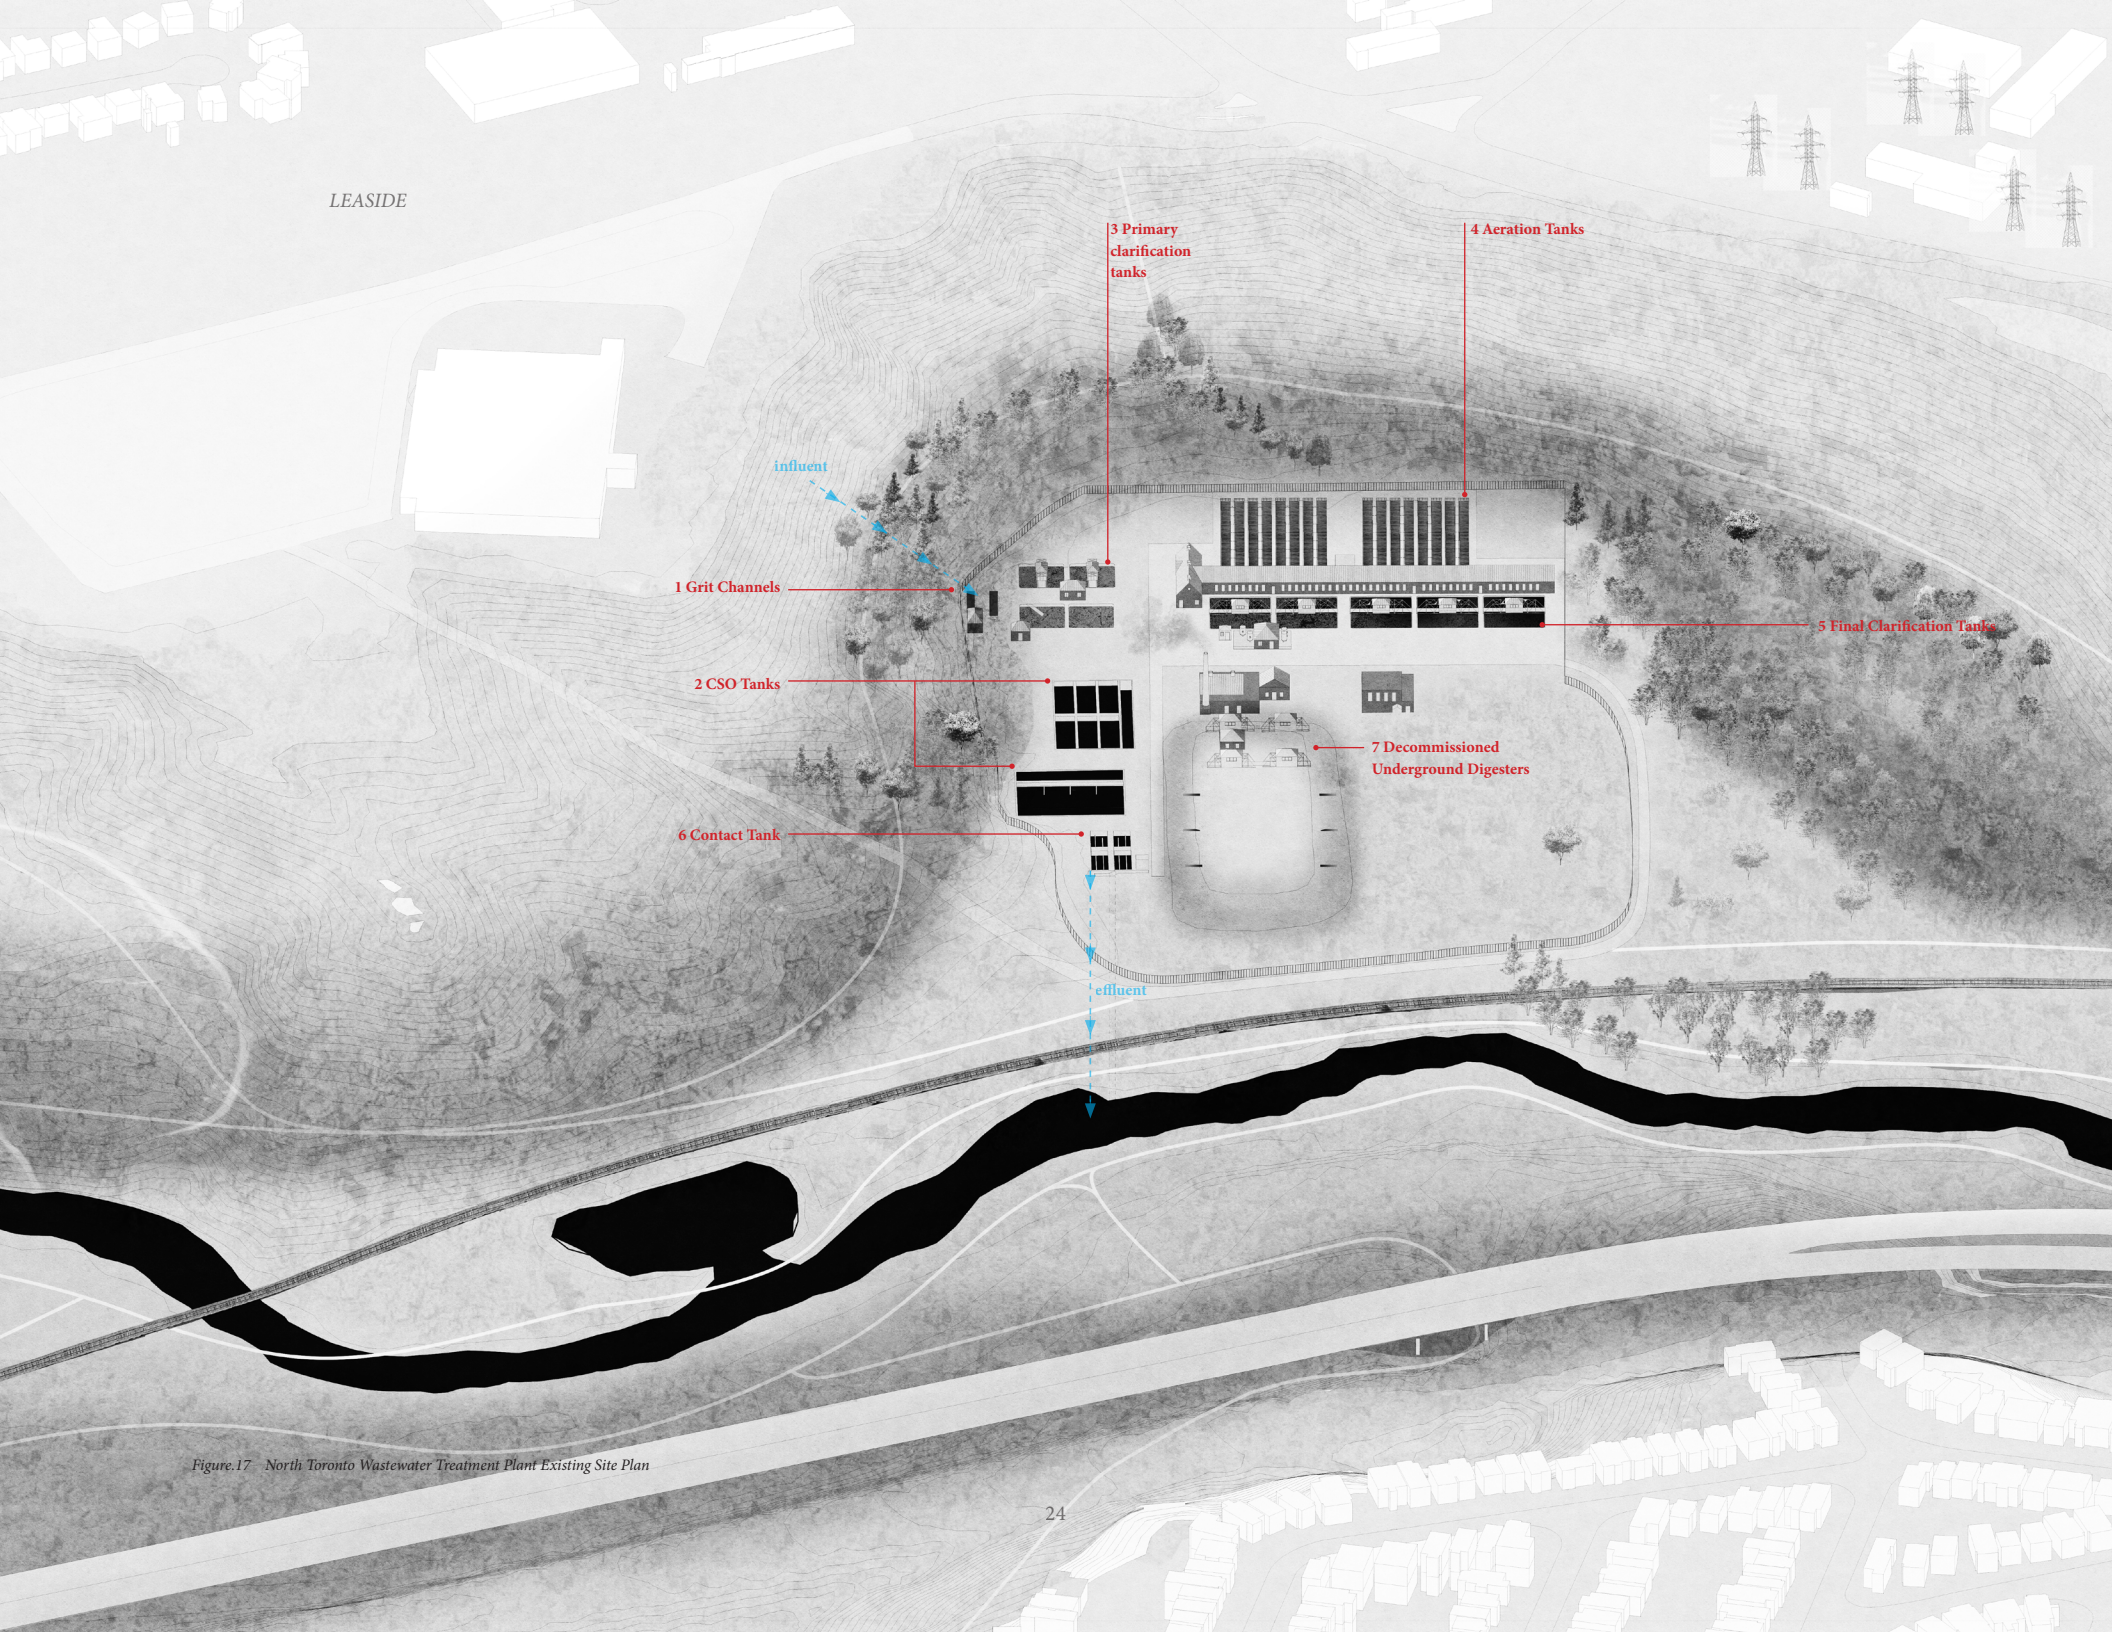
North Toronto Wastewater Treatment Plant Existing Site Plan
